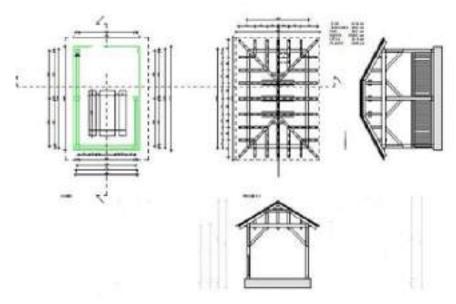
gazebo made of stone slabs, wooden construction and covered with clay shingle- (without designated barbecue)
